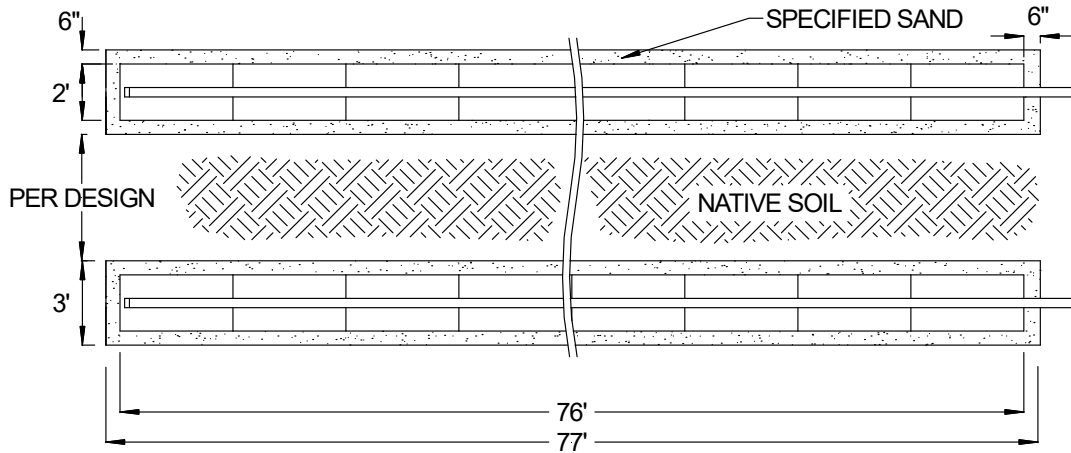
SECTION VIEW – A42 MODULES – TRENCH SYSTEM – LEVEL SITE
